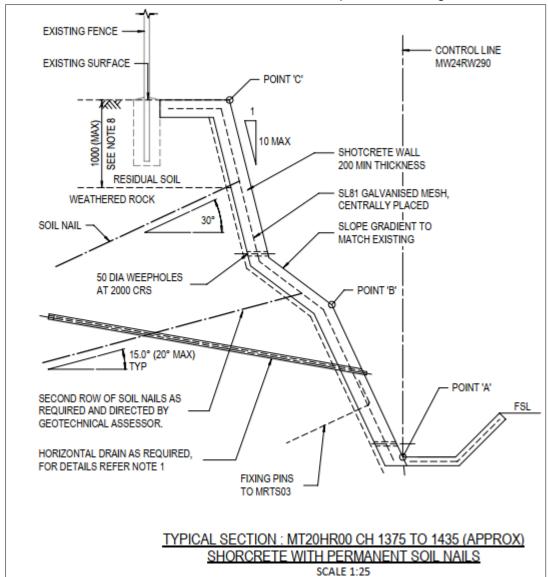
Soil Nail Typical Detail (South of Land Bridge)
